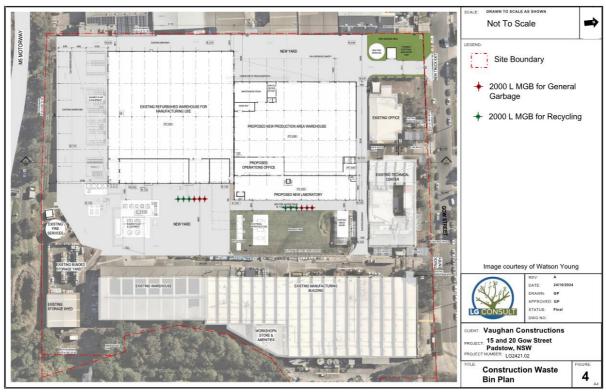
Construction Waste Bin Plan (Source: LG Consult, 2024)
